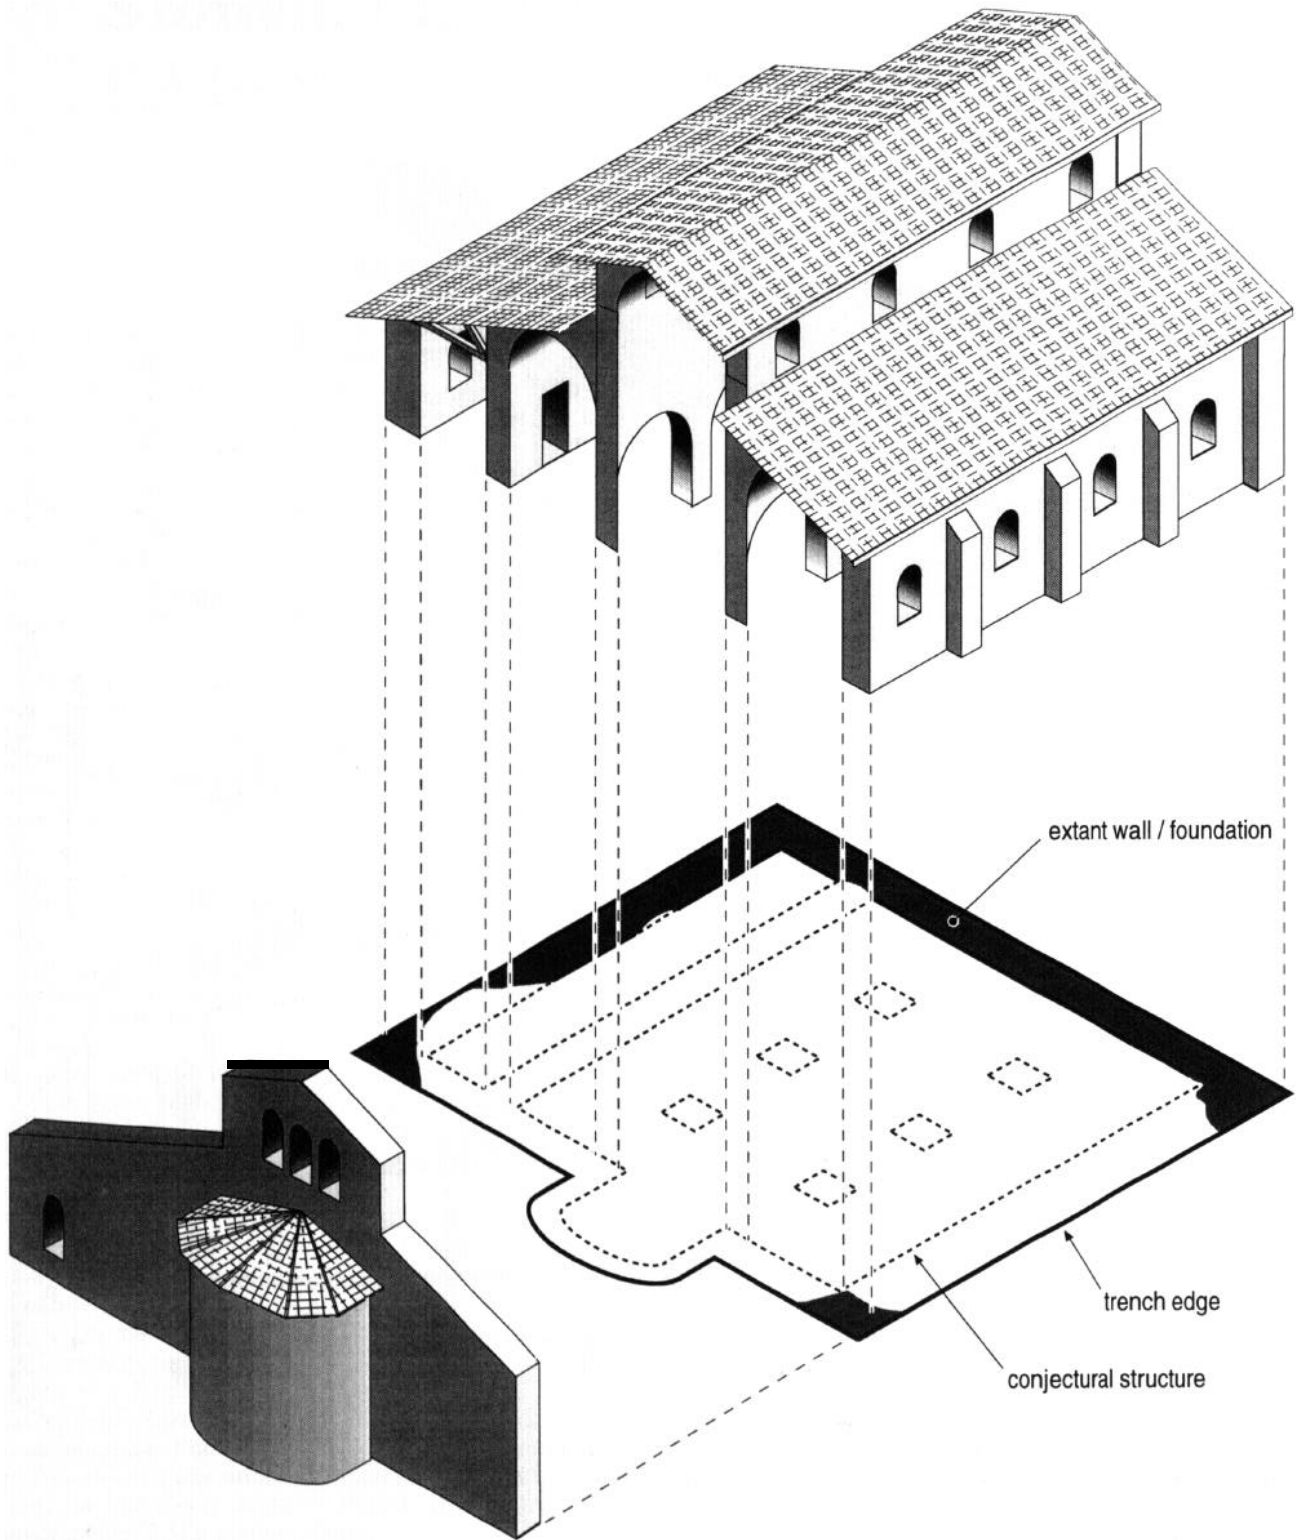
Reconstruction of the main stone building (S Crummy)
